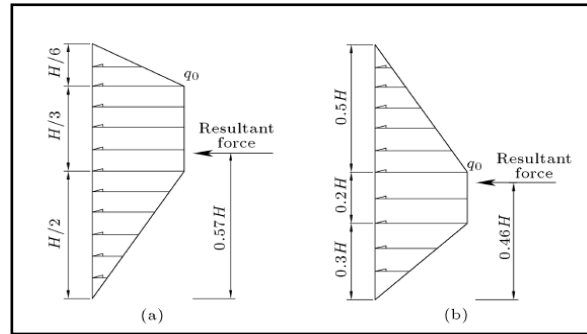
Suggested approximate seismic soil pressure distribution (a) typical distribution suggested here for rigid walls and semi-rigid walls, such as bridge abutment and propped bridge abutment, (b) distribution suggested for flexible walls such as cantilever retaining walls taller than 5 m, (Maleki and Mahjoubi, 2010).
